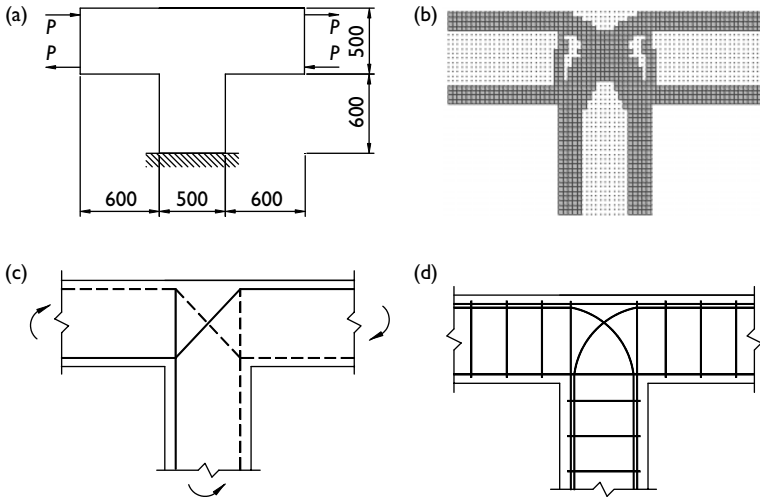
(a) Design domain; (b) optimal topology; (c) strut-and-tie model; (d) reinforcement for interior beam–column connection.
